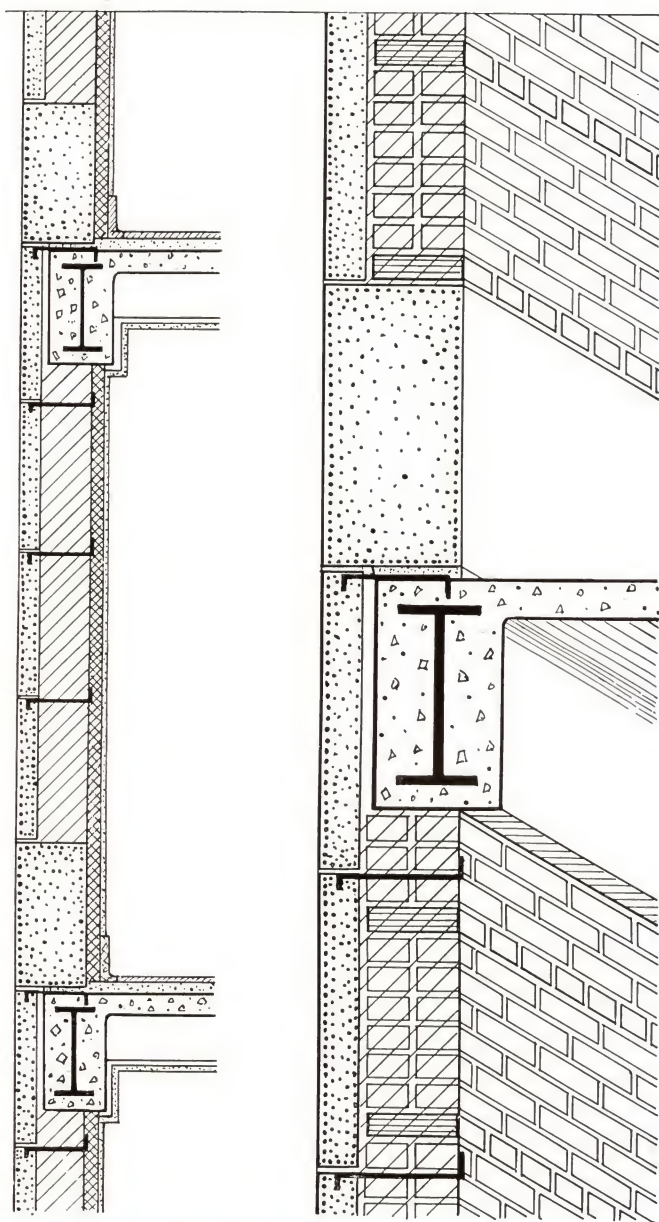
Stone facings with bond stones bonded and anchored to backing and to frame.
